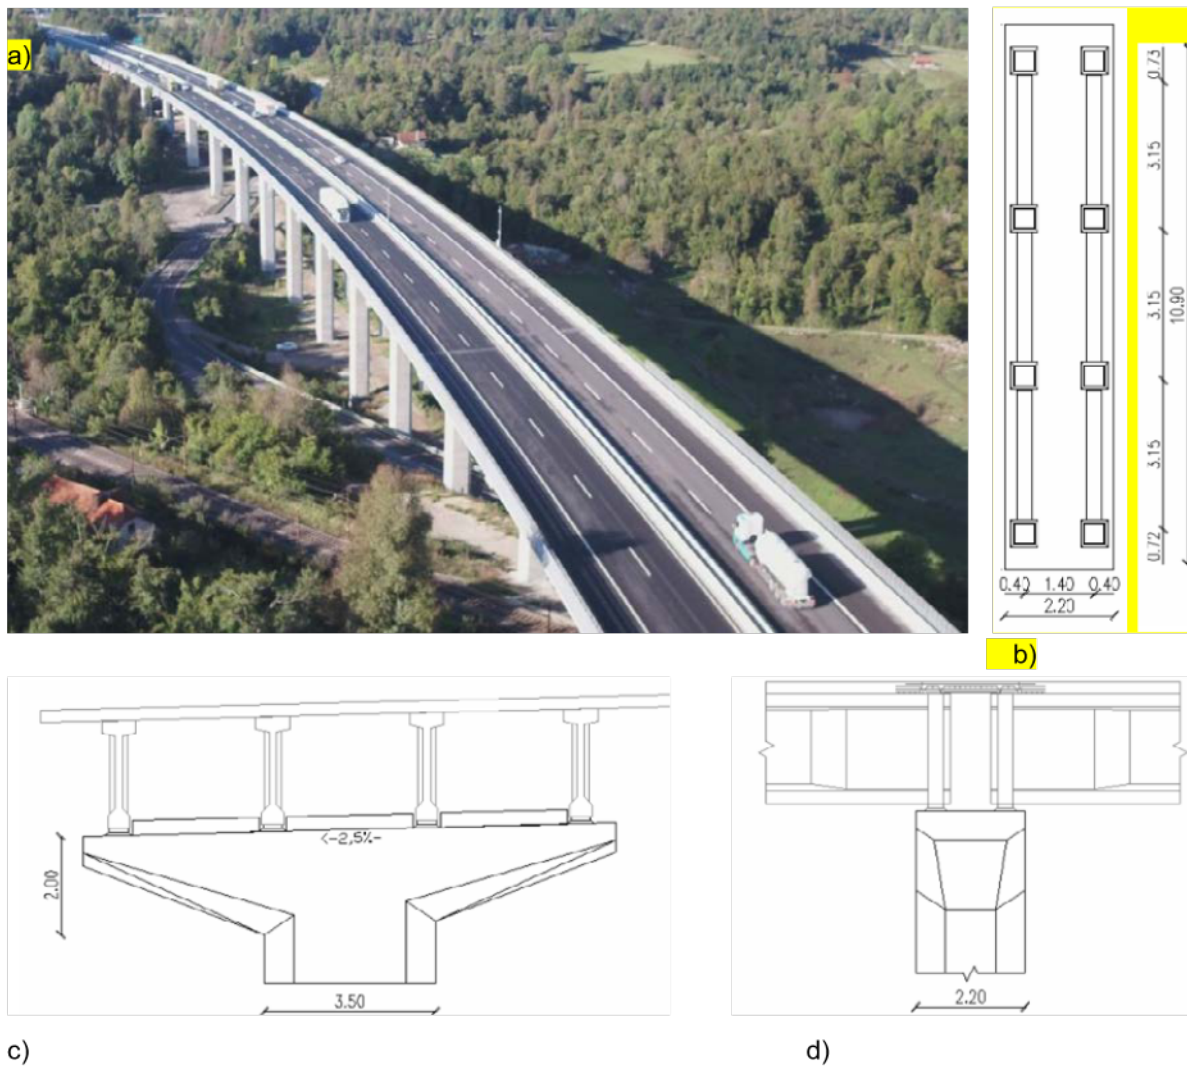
Ravbarkomanda viaduct: (a) aerial photo (Postojna direction), (b) plan view of pier cap, (c) pier cap and superstructure cross section, (d) side view of pier cap and superstructure
